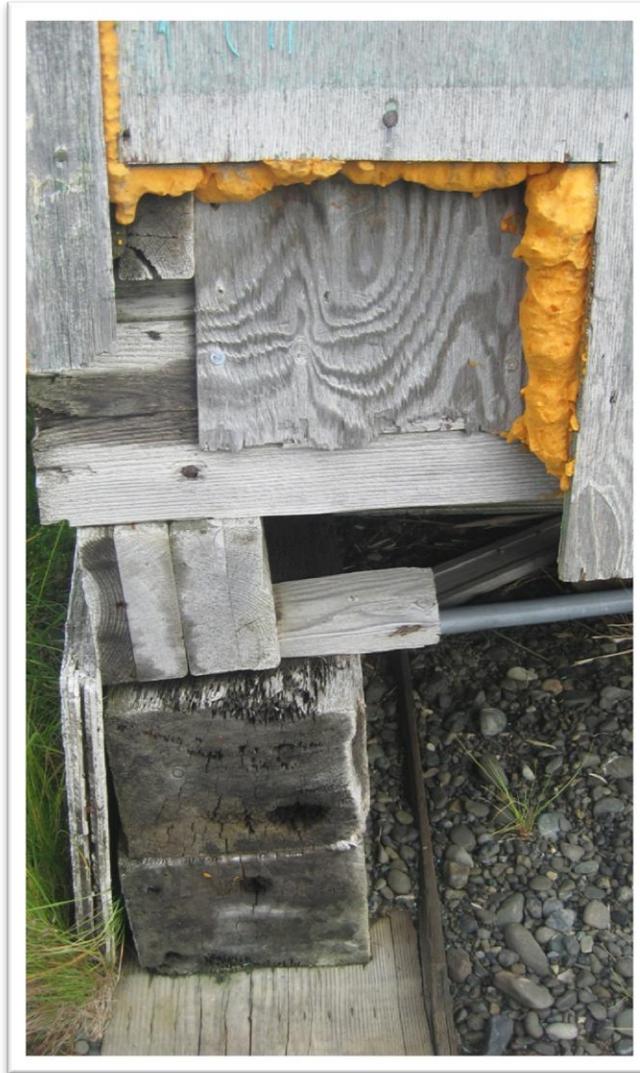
Katie Cleveland home foundation corner. The understructure of the home likely could withstand a move but heat loss is an overriding concern. Elevated structure is sitting on wood blocking foundation system with sturdy cross members.
